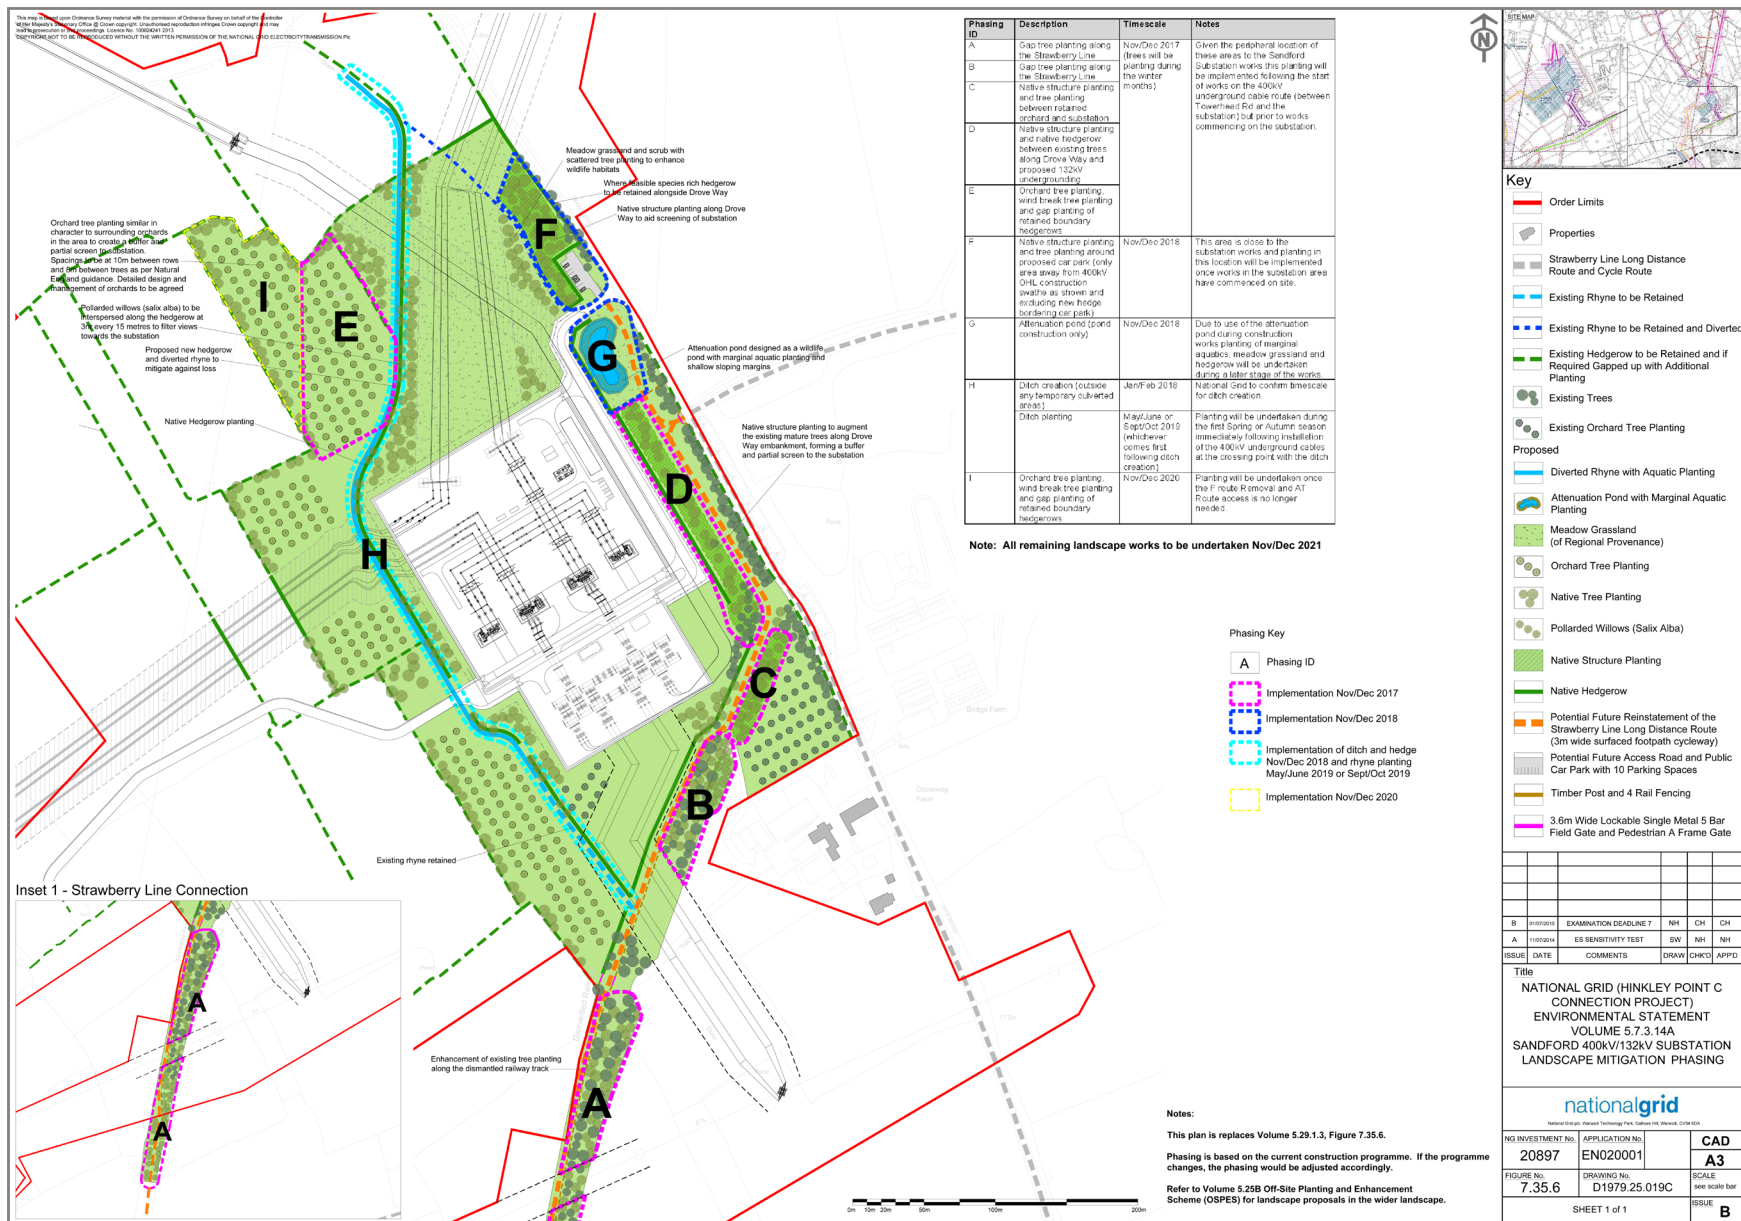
Sandford Substation Updated Landscape Mitigation and Phasing Plan
